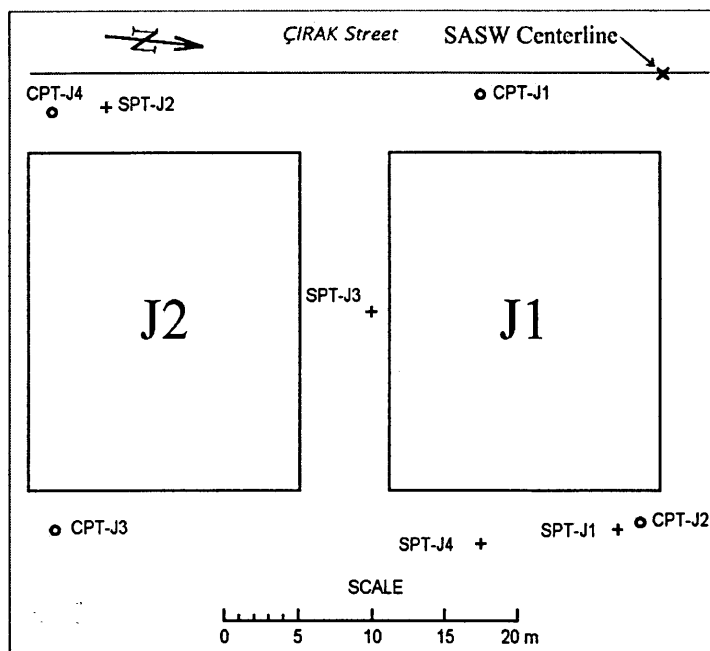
Plan view of Site J showing the location of one SASW centerline (modified from <http://peer.berkeley.edu/turkey/adapazari>).
